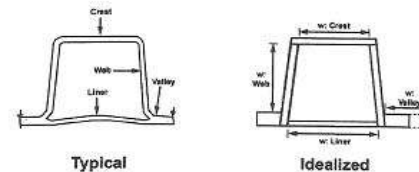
1 Typical and Idealized Cross-Section of Profile Wall Pipe.
